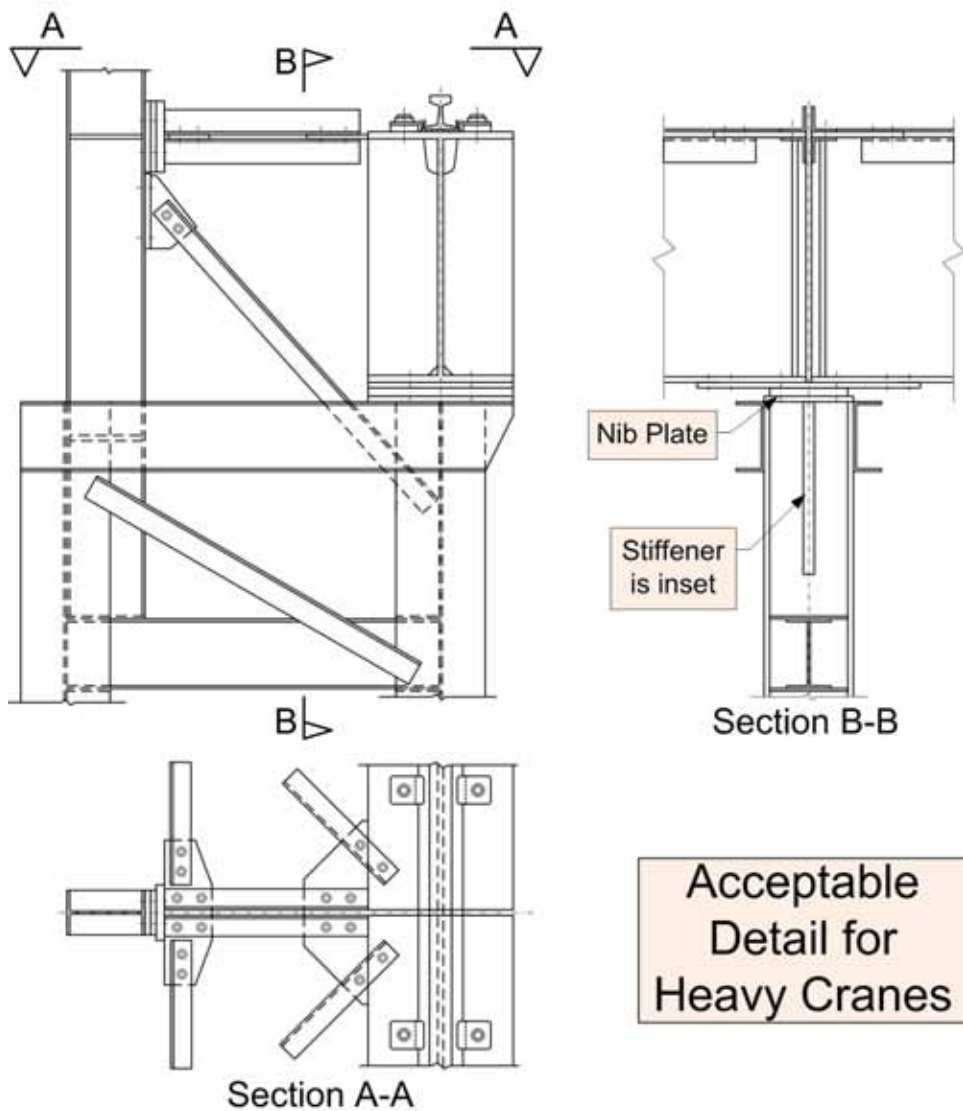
A heavy support structure detail making use of a surge girder (horizontal truss).
